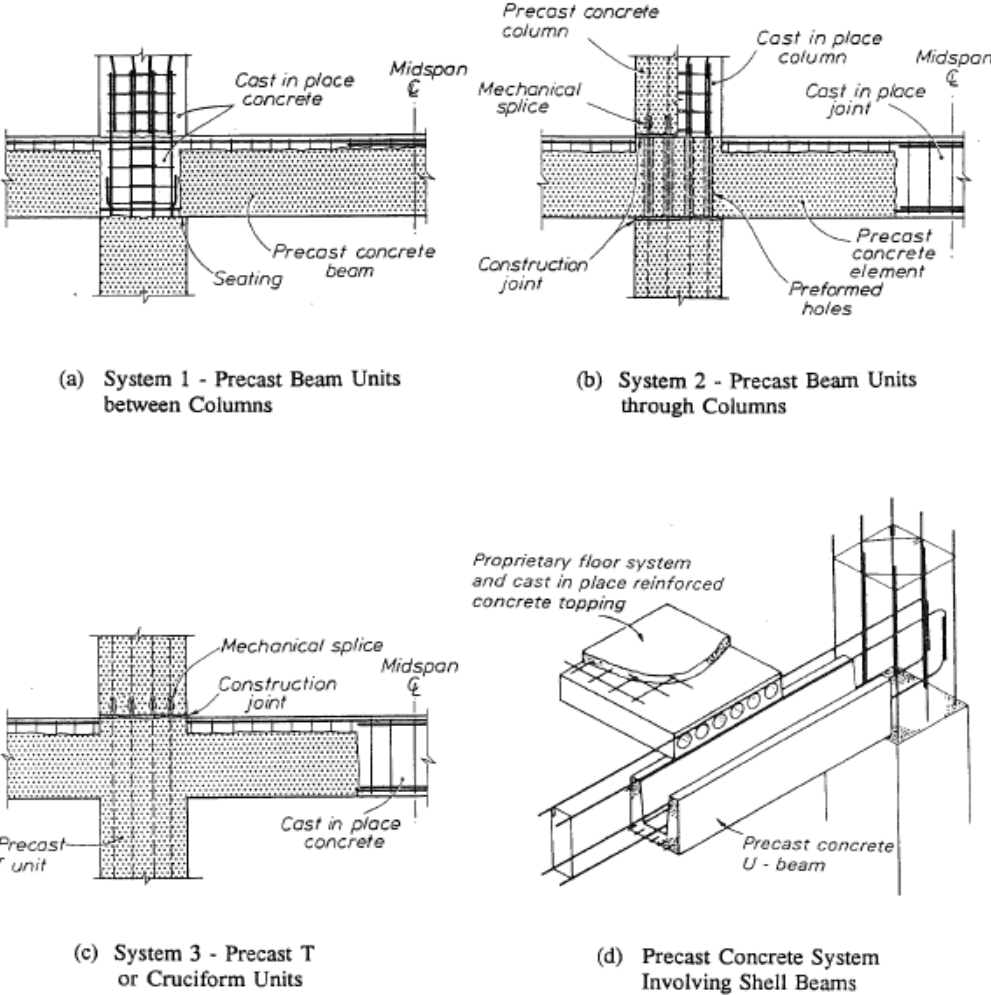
Commonly used arrangements of Precast Members and Cast in Place Concrete for Constructing Moment Resisting Reinforced Concrete Frames in New Zealand. (Restrepo 1992)
